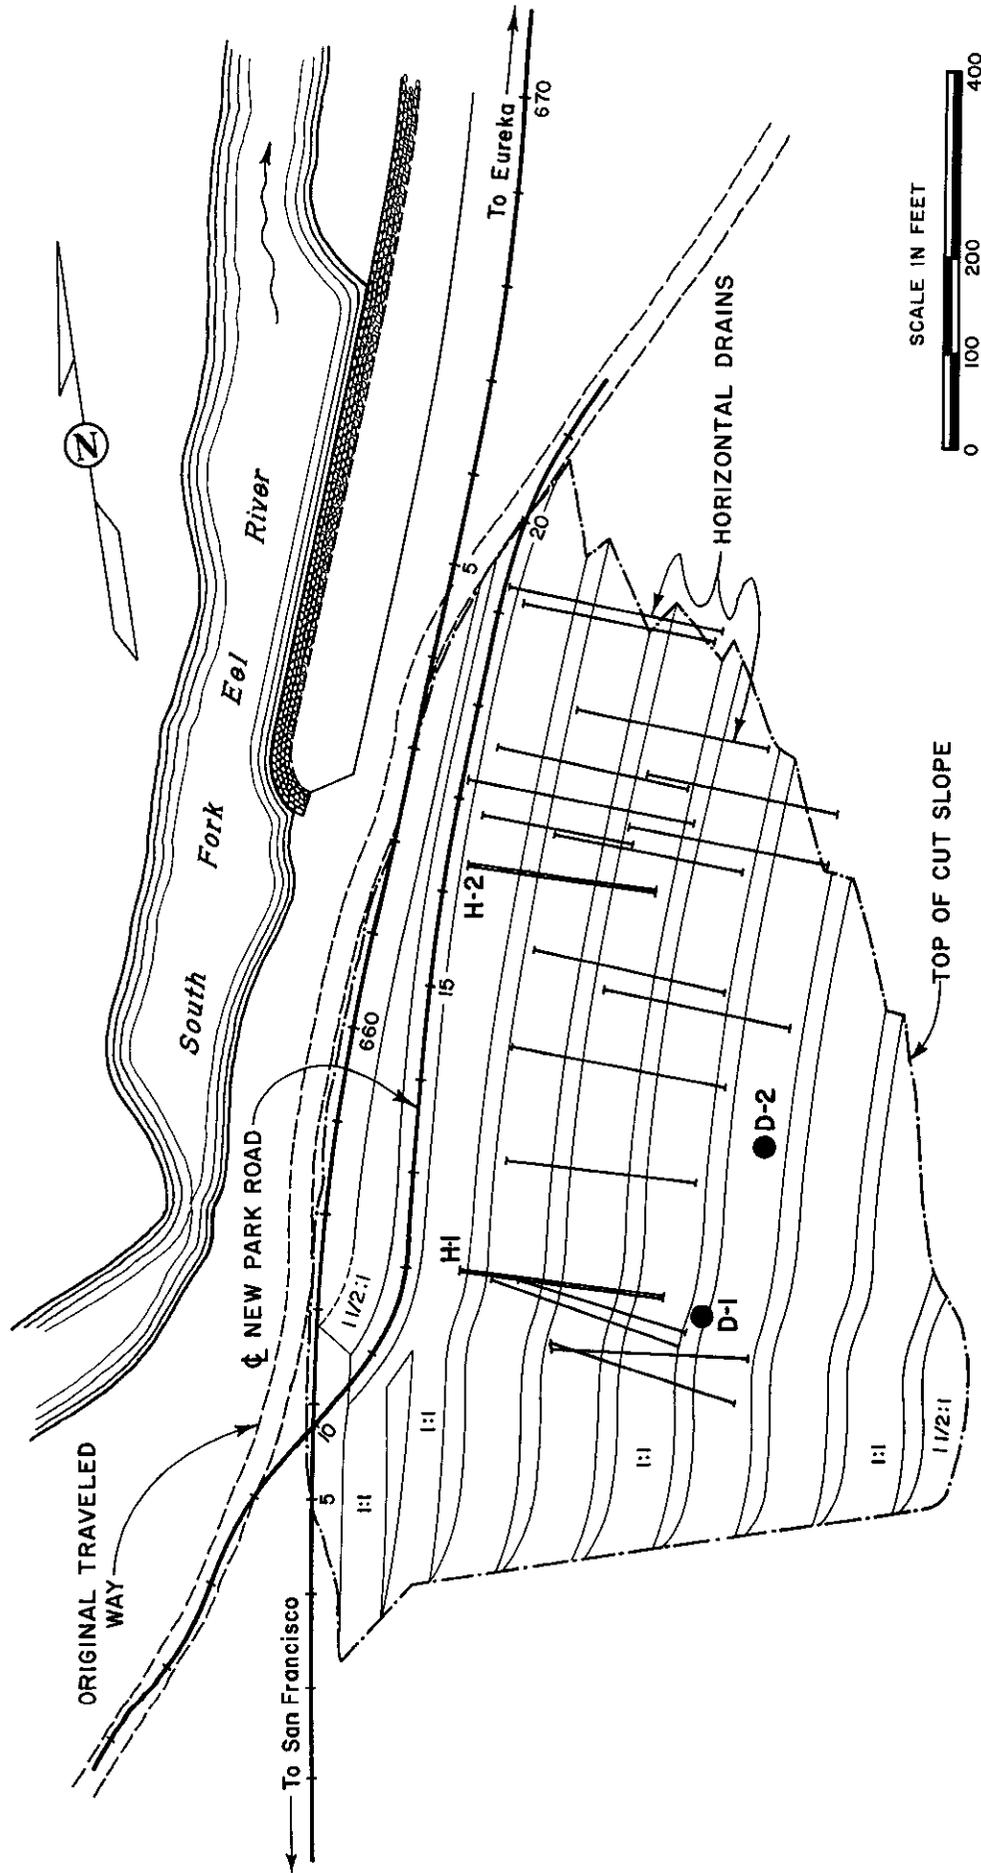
PLAN OF DYERVILLE CUT SHOWING HORIZONTAL DRAINS AND BORINGS
